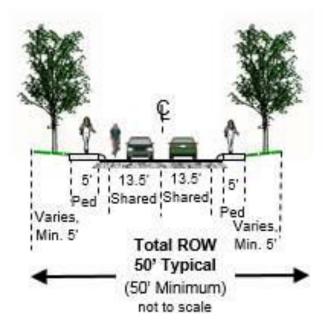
Typical Cross-Sections—Local Street Functional Class
